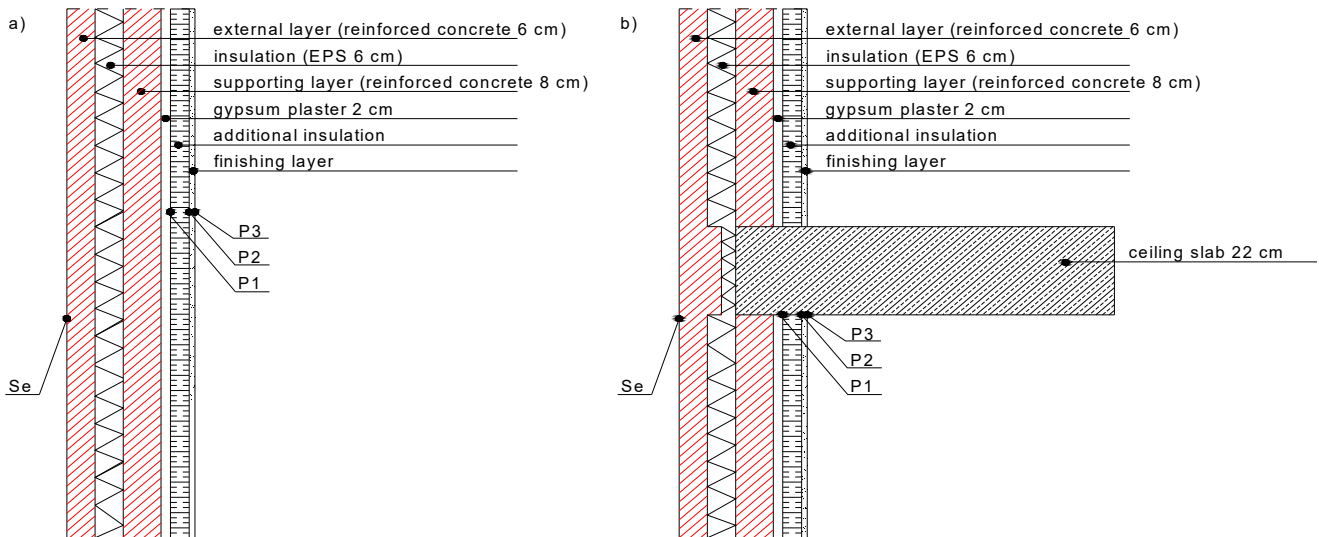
Scheme of investigated construction (a) one-dimensional standard cross-section, (b) two-dimensional joint of wall and ceiling
